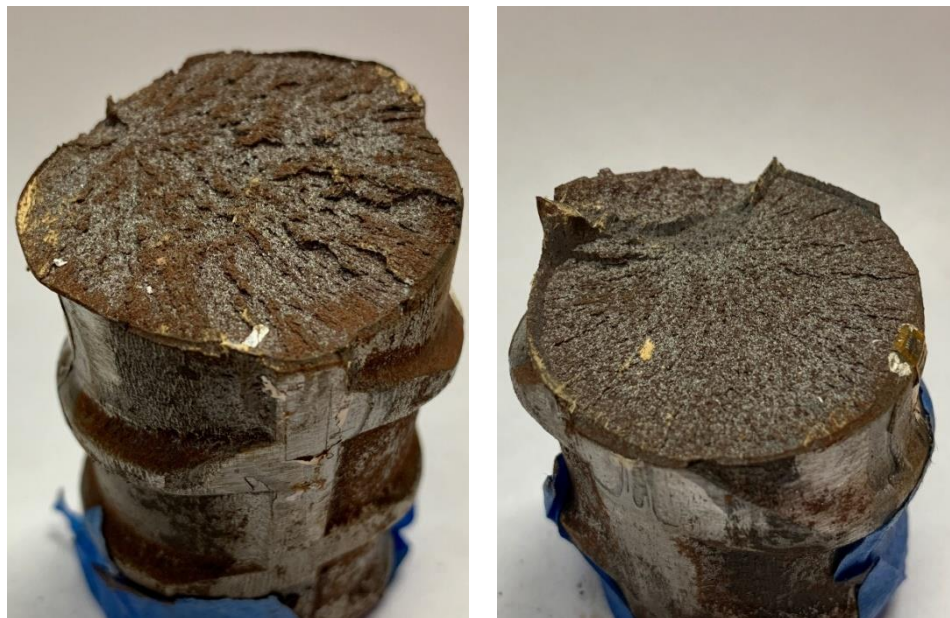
Fracture Surface of (a) Spec01 (SH1); (b) Spec10 (SH1)
